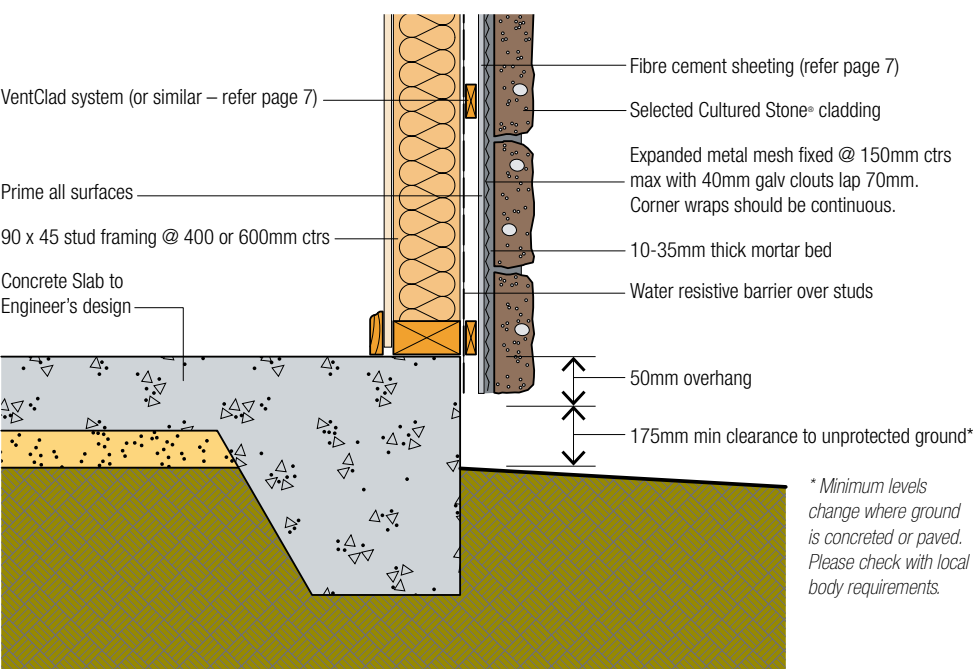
Typical Cladding Transition - Section (Dwg # CS-06.01)
